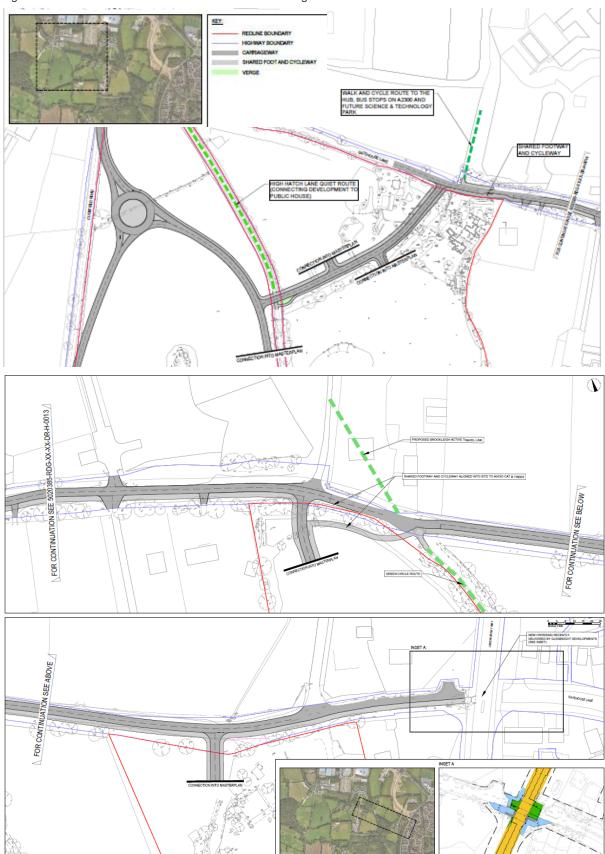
Gatehouse Lane Active Travel Route Drawing
